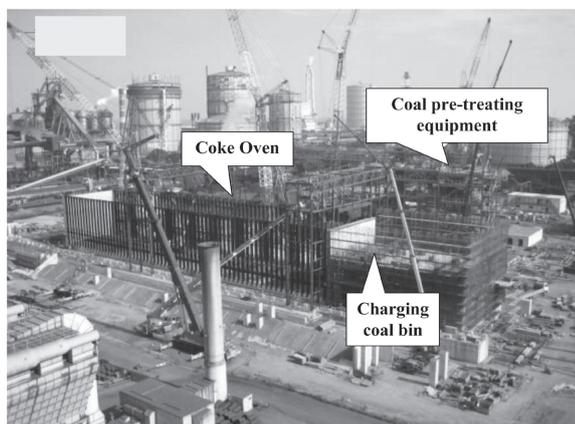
Outlook of Oita No.5 coke oven battery (under construction)
